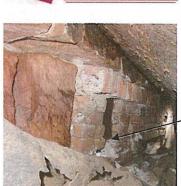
North parapet wall. Note interior course of brick had fallen away from the wall.
